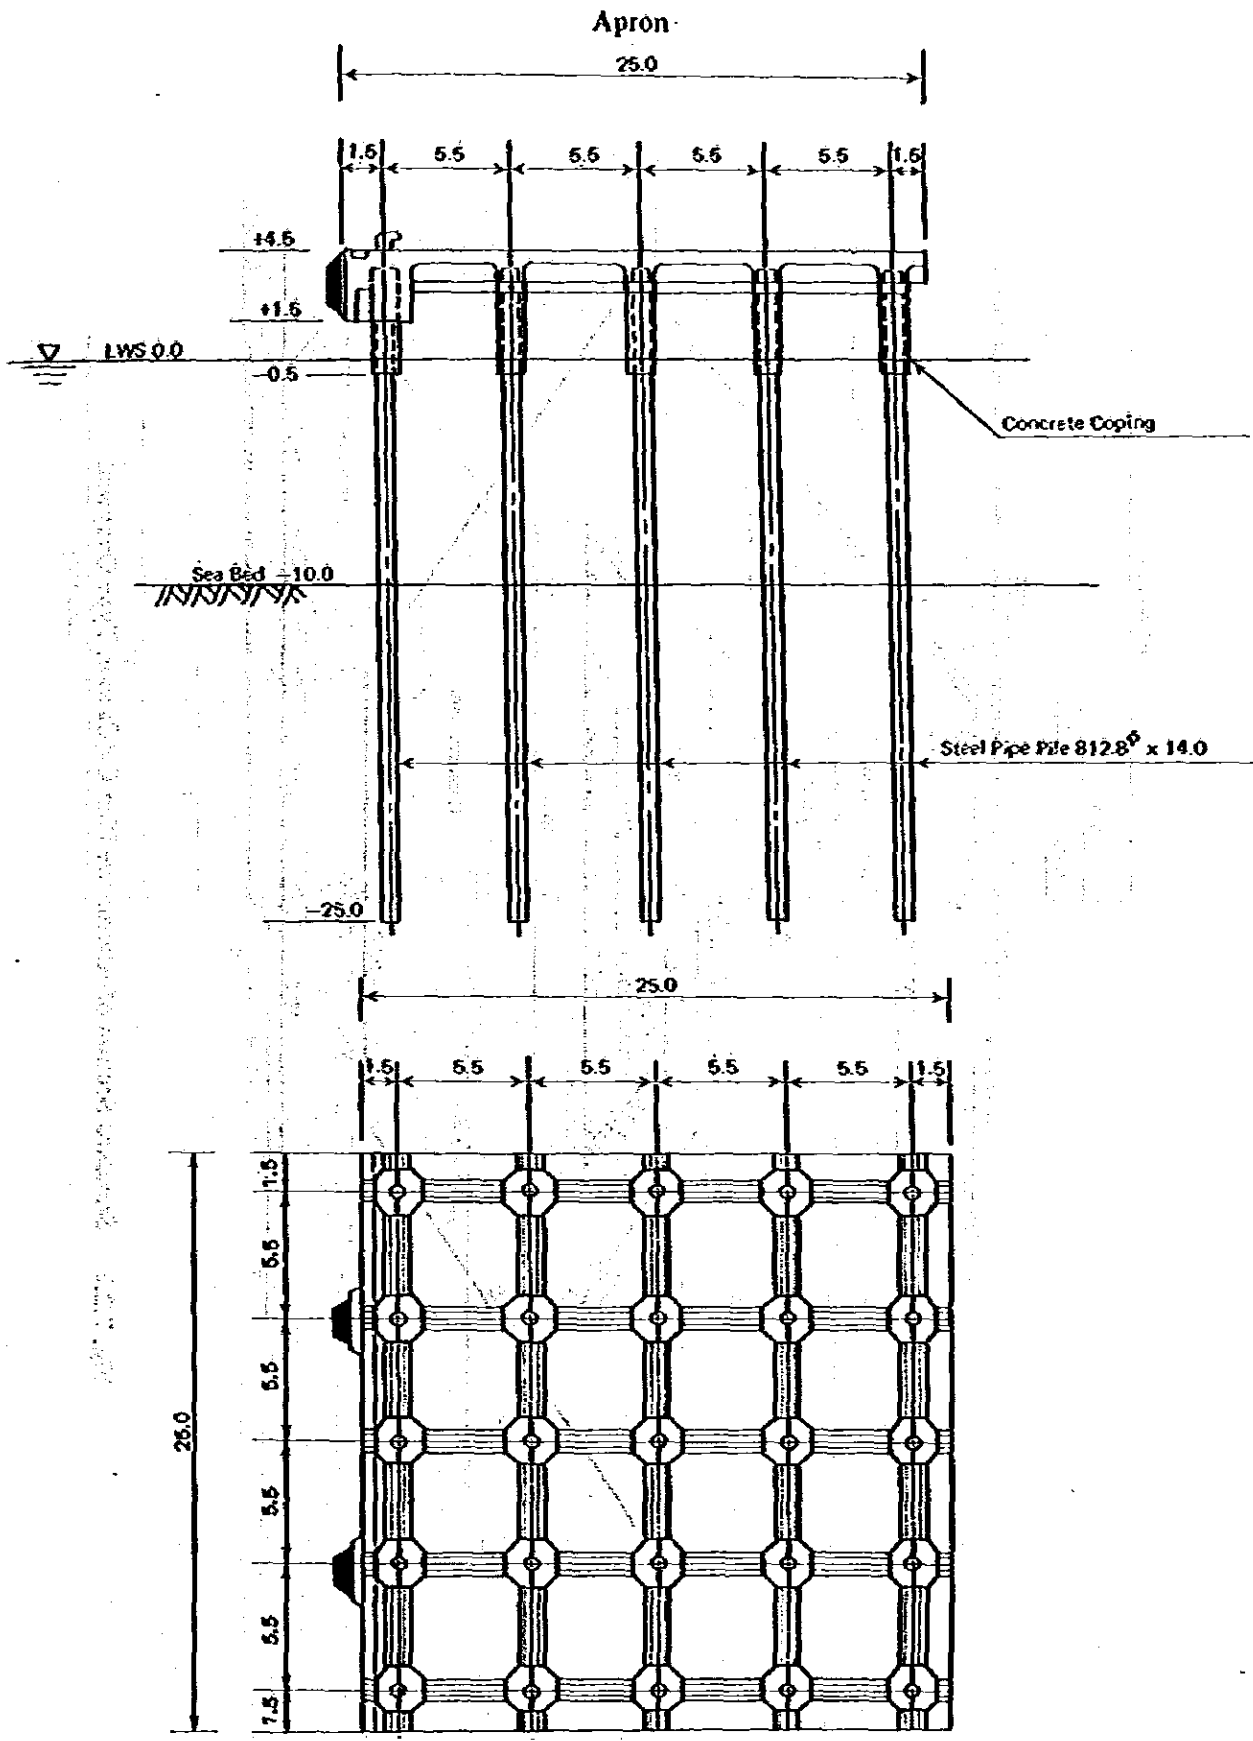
Standard Section of Alternative Plan B (Open-Type Wharf with Vertical Piles)
